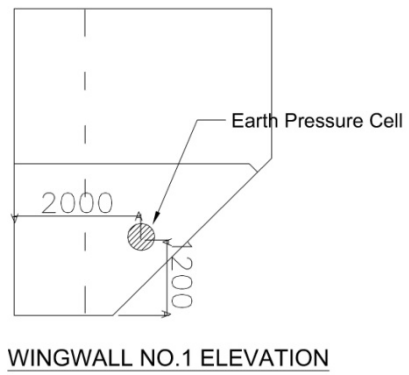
Wingwall Earth Pressure Cell at the East Montpelier Bridge (Wingwall 1)
